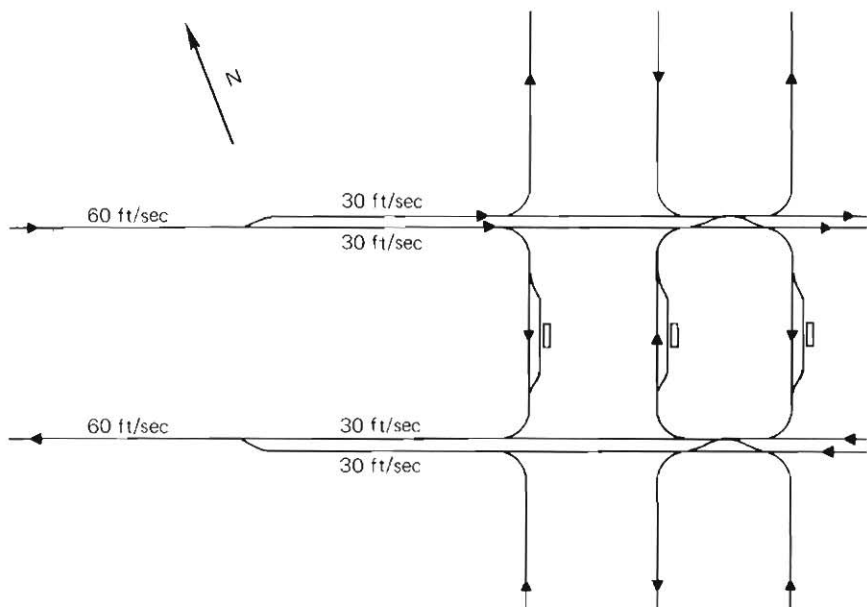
Typical Detail of Downtown Los Angeles Single-Level Network
